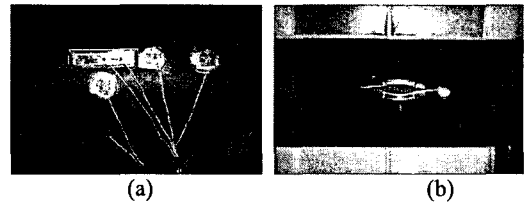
Test set-up of full-scale burst test for pipes; (a) defect (b) failure
